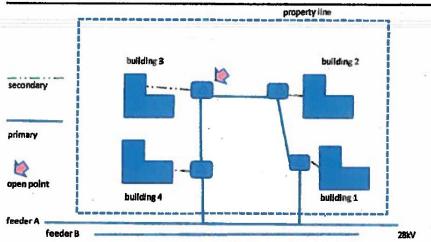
MULTI BUILDING CONNECTION greater than 1,000kVA
